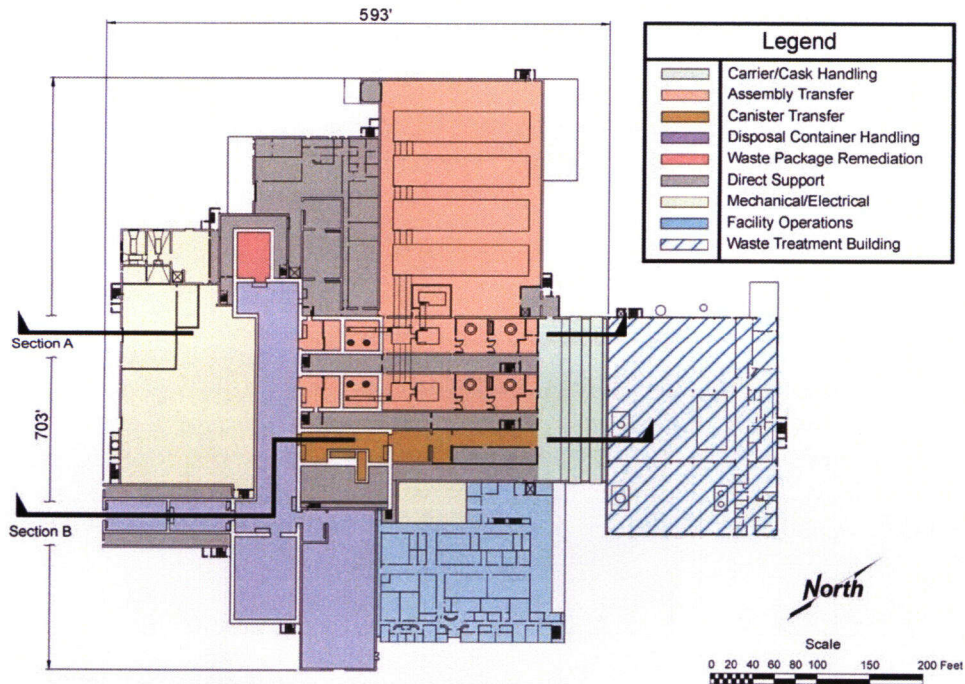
Waste Handling Building Layout Showing Assembly Transfer System (DOE, 2001b)
